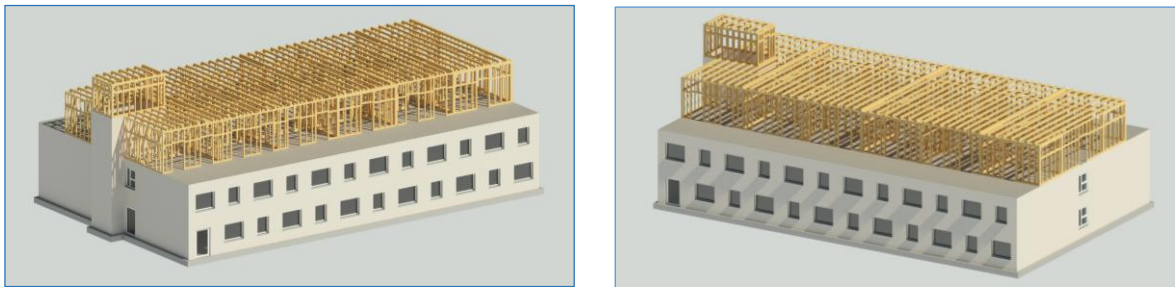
3D architectural views of case study building including the LFT top addition before installing the OSB sheathing panels.
